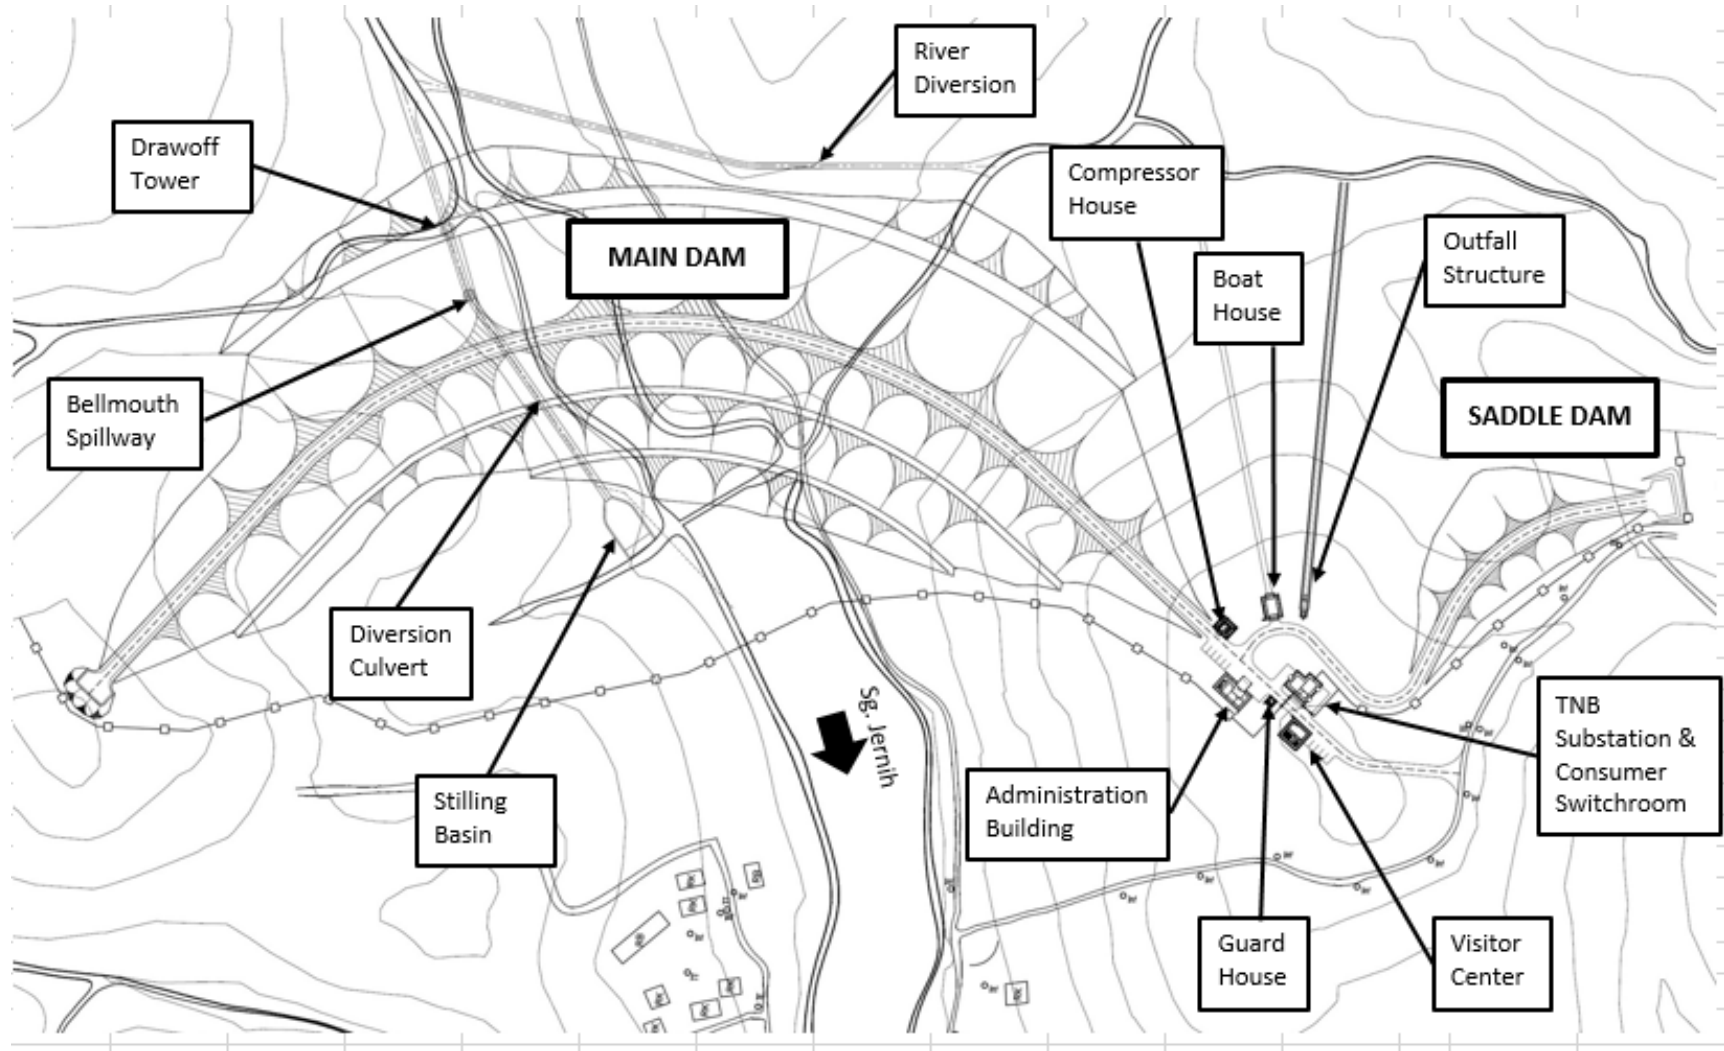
Dam Layout Plan (Source: SMHB Sdn. Bhd, 2015).
